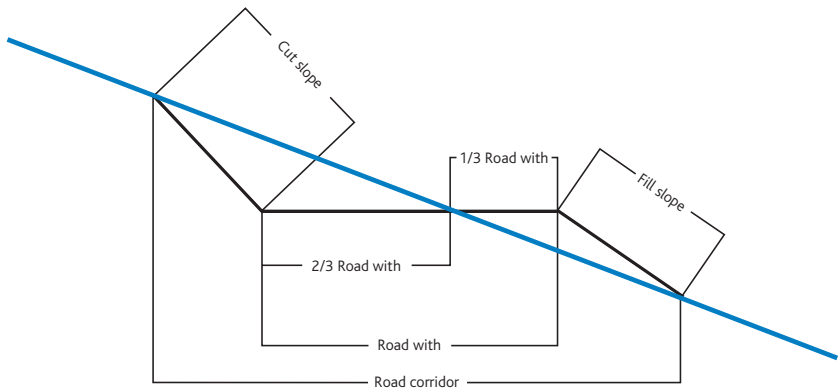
Typical Cross section for construction with bulldozer/angle dozer [PERTLIK]
